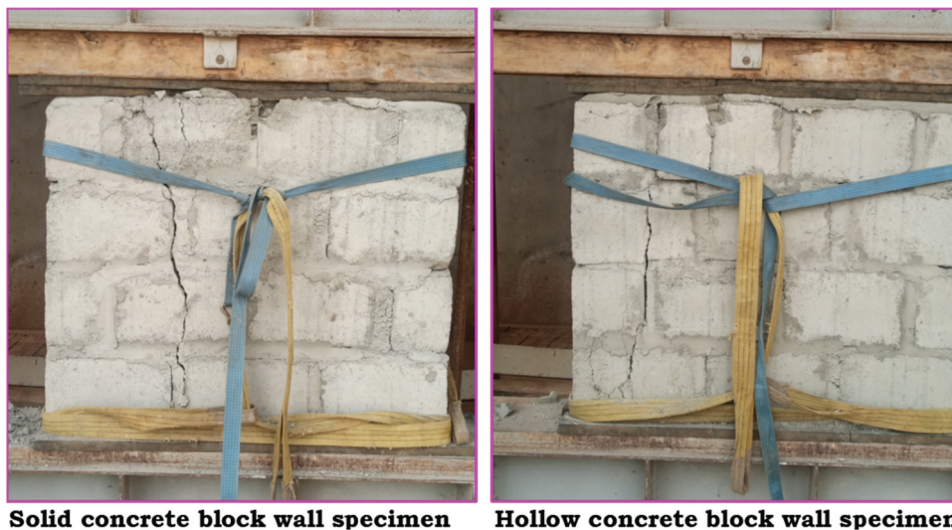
Crack propagation for concrete block walls at peak load.
